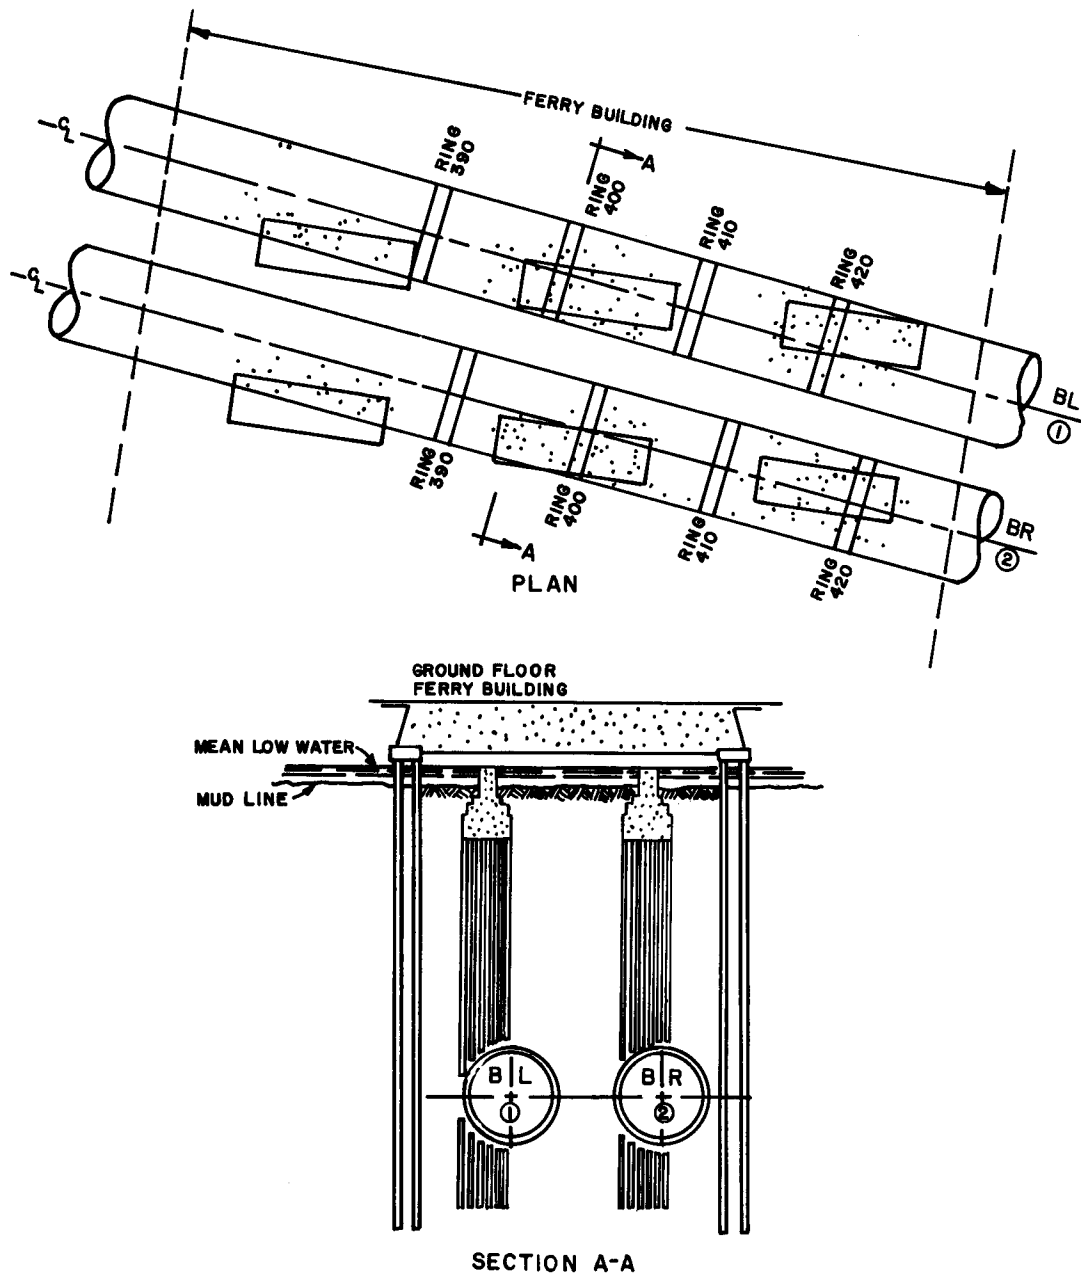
Actual Pile Locations at the Tunnel Face and the Presuming Pile Locations in Construction Plan
